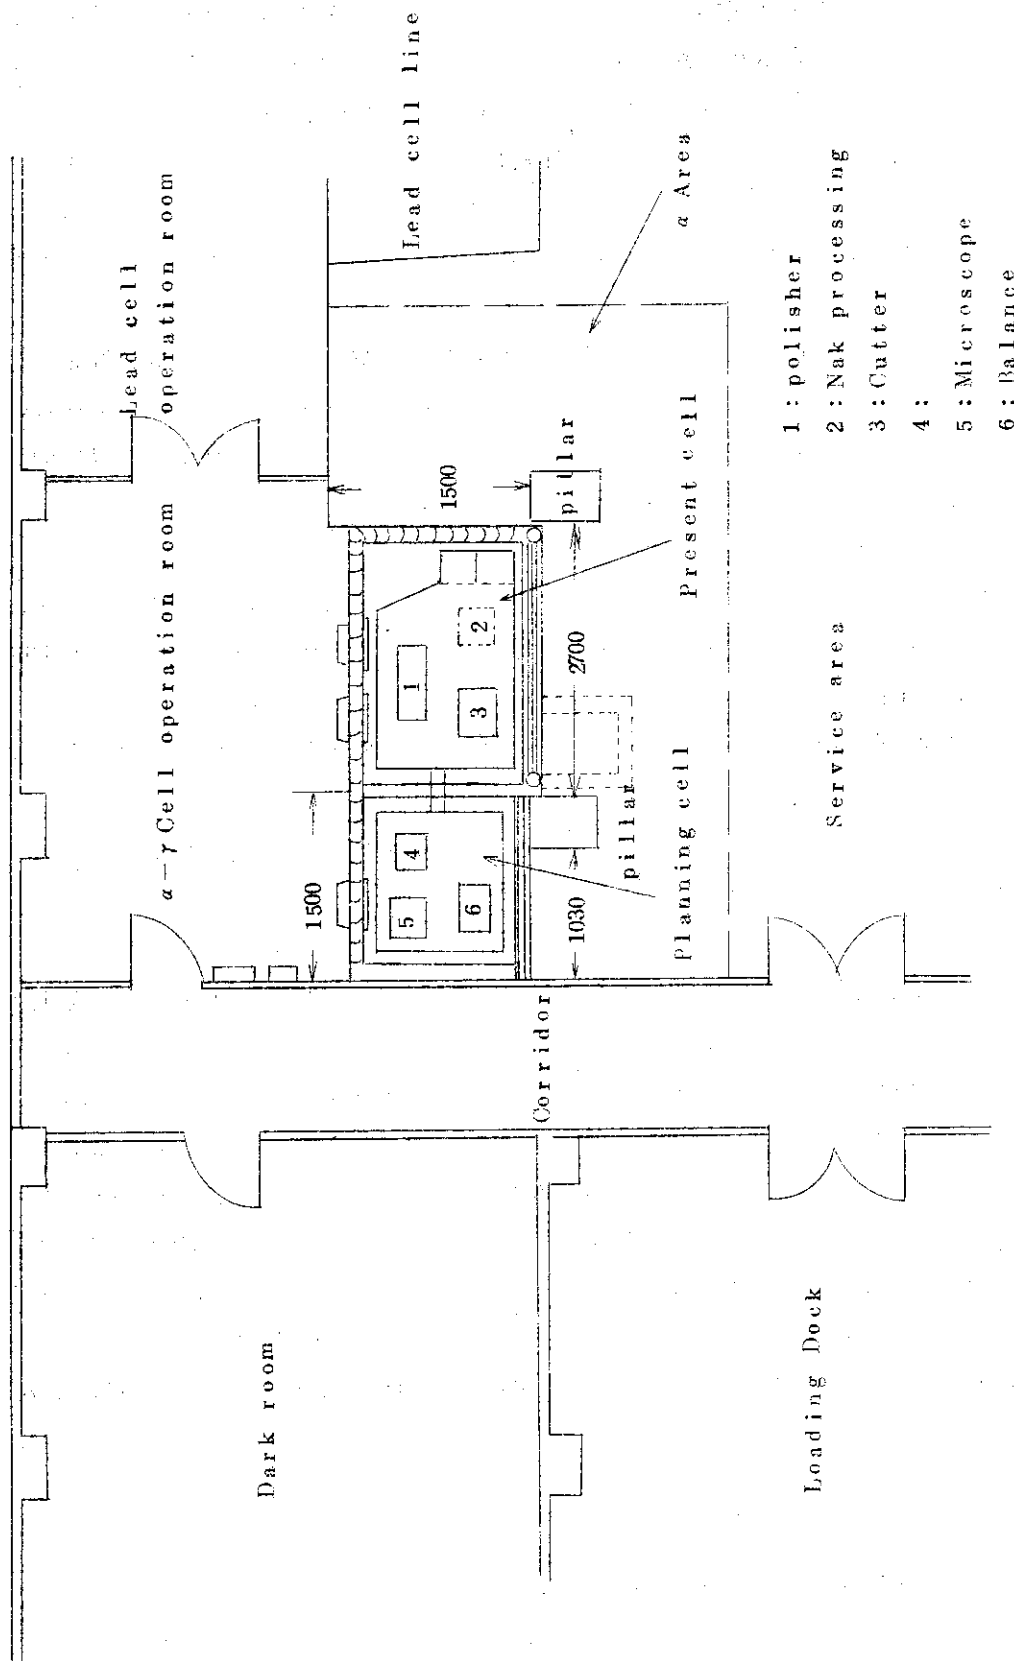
alpha-gamma Cell reconstruct plan.
